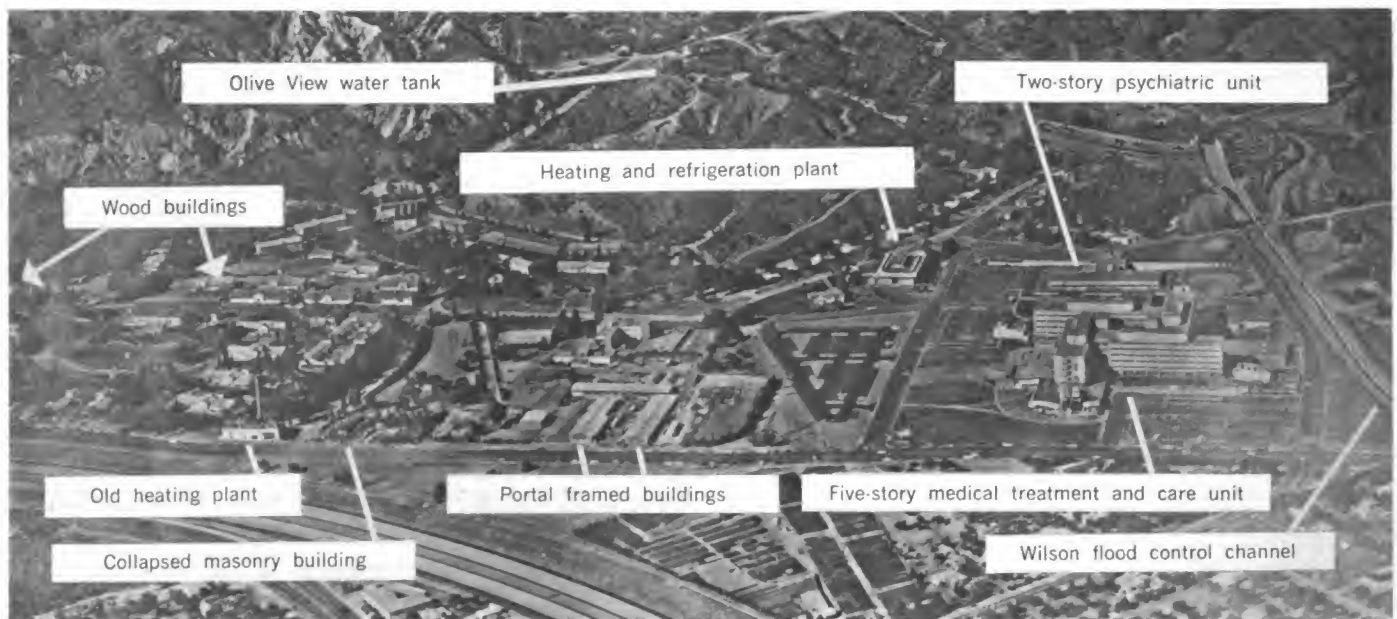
Olive View Hospital complex, looking north. Old complex is to left and new complex to right. California Institute of Technology photograph.
